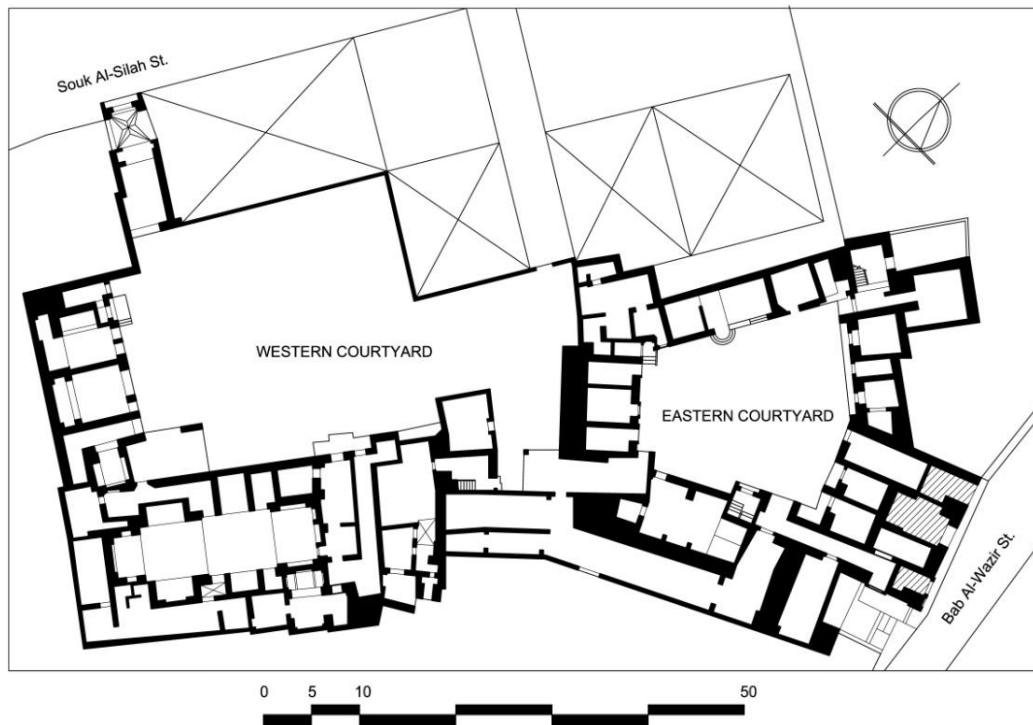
Ground floor plan of Bait ar-Razzāz.
